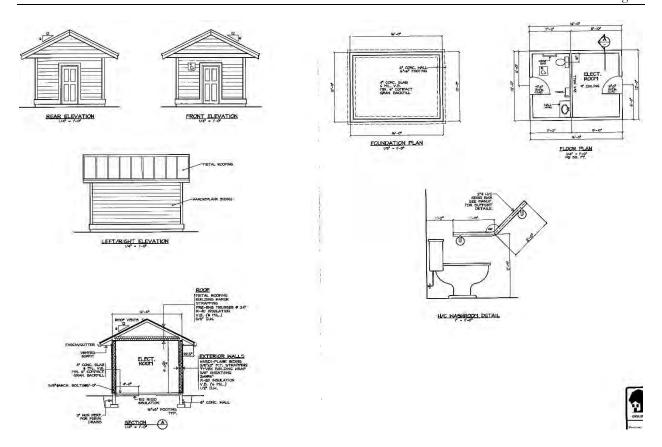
Elevation Drawings of the Washroom and Electrical Room
